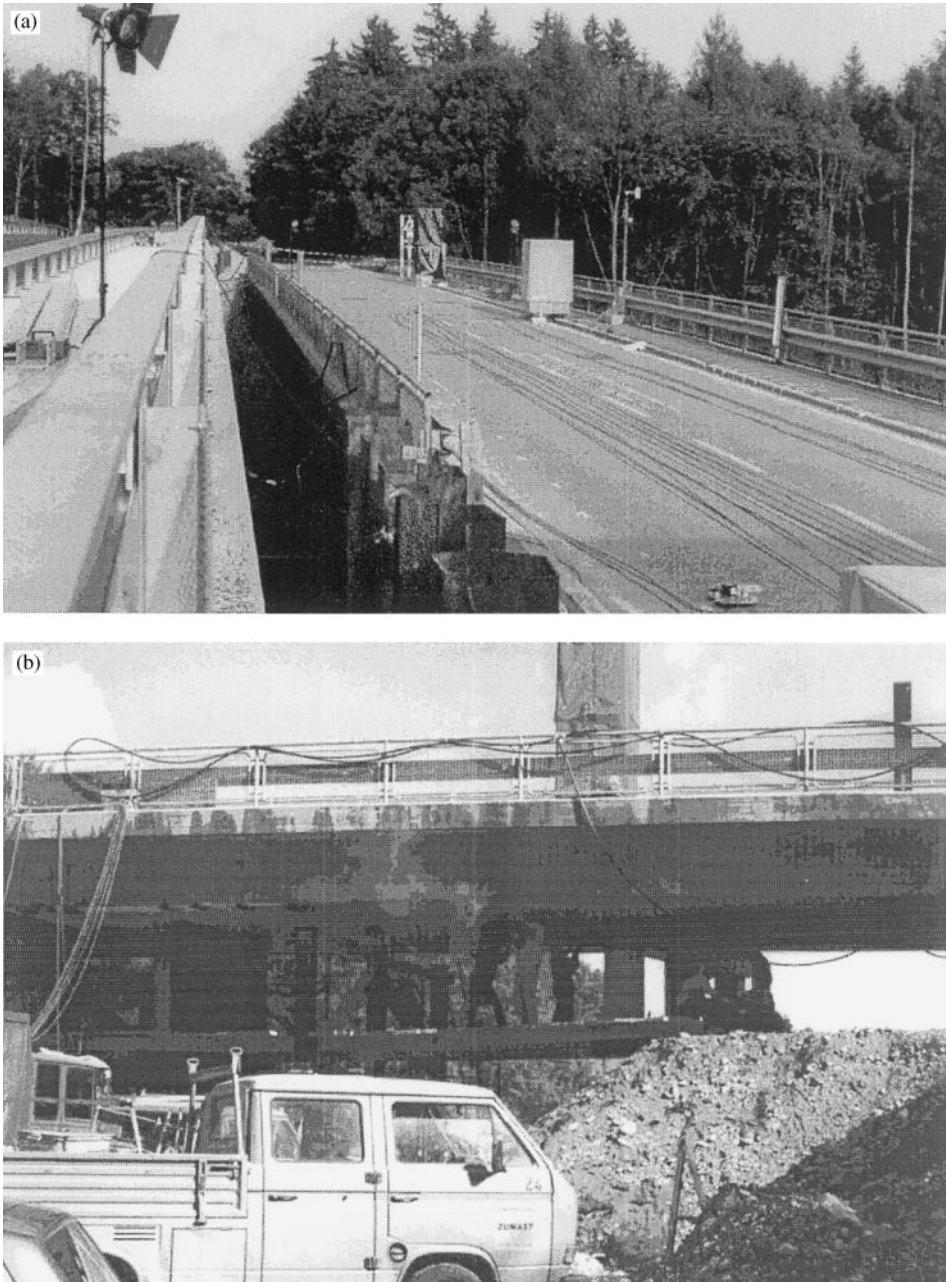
Bridge Z24, (a) top view, (b) bottom view.
